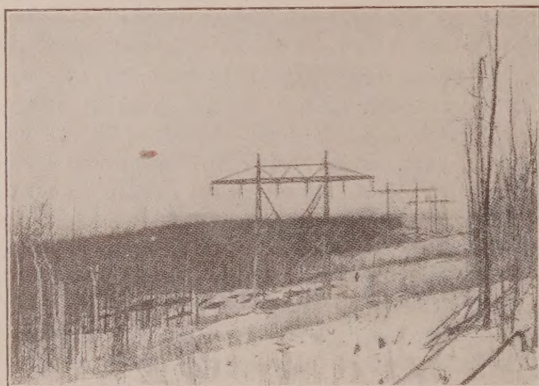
A SECTION OF THE LINE SHOWING TYPE OF REPLACEMENT TOWERS
